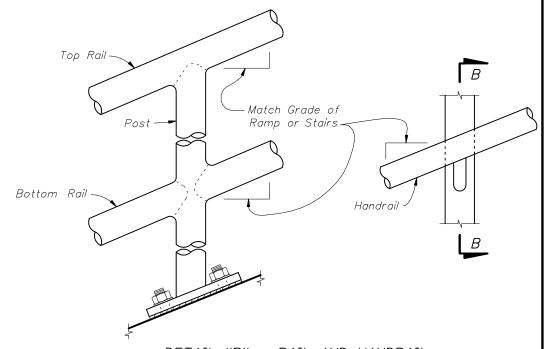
## DETAIL "C" - RAIL CONNECTIONS (Handrail Not Shown)
